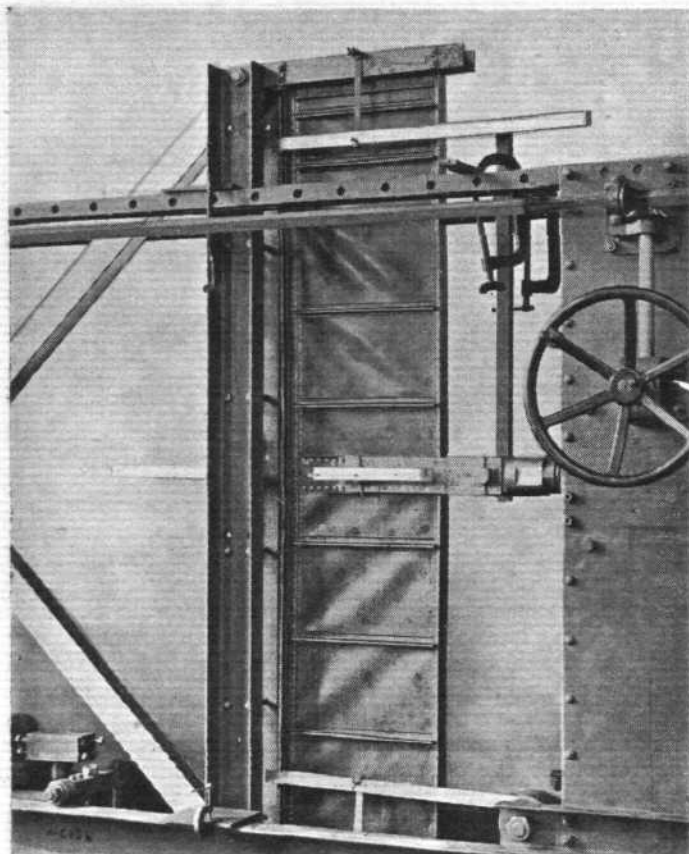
Sheet-web spar. Correctly spaced stiffeners. Booms not deformed.
